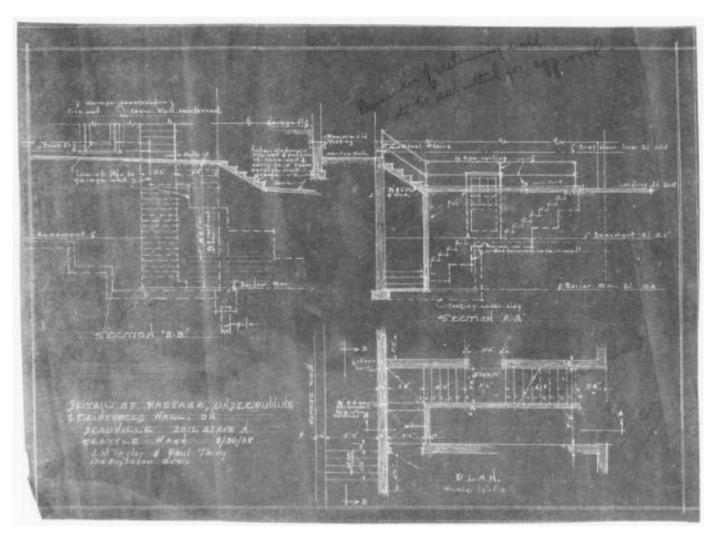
"Detail of Passage Underpinning & Reinforced Wall on Beauville. 2012 43rd Ave N [...] 11/30/28 J.M. Taylor & Paul Thiry"
